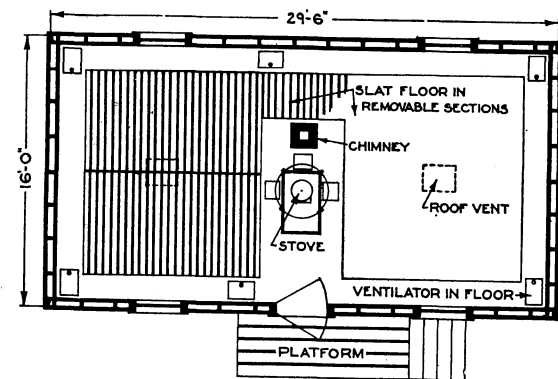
Floor plan of a sweet-potato storage house, size 16 by $29\frac{1}{2}$ feet, having a capacity of about 1,000 bushels in crates, showing arrangement of floor ventilators, roof vents, chimney, and other structural details
